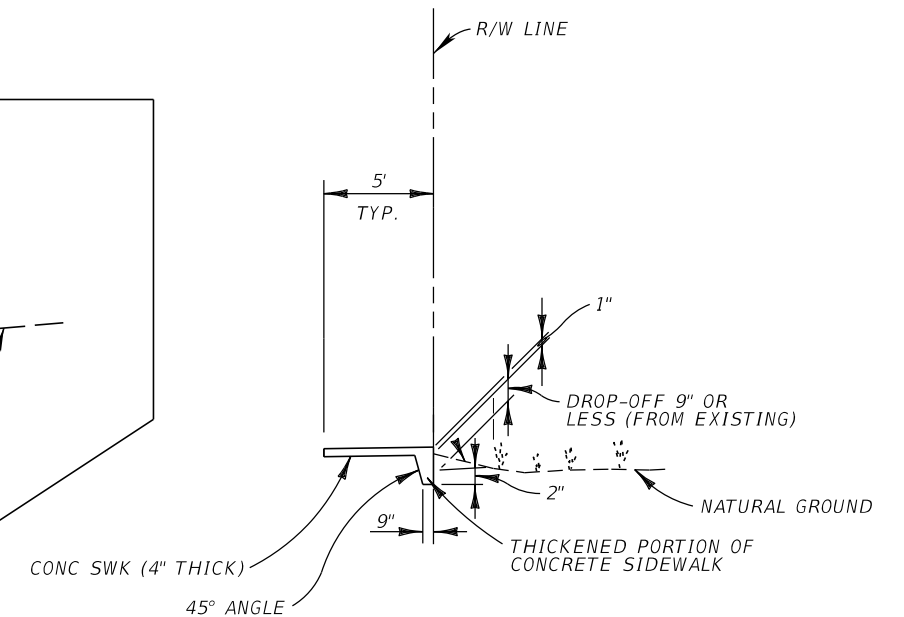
DETAIL FOR SIDEWALK CONSTRUCTION (N.T.S)
